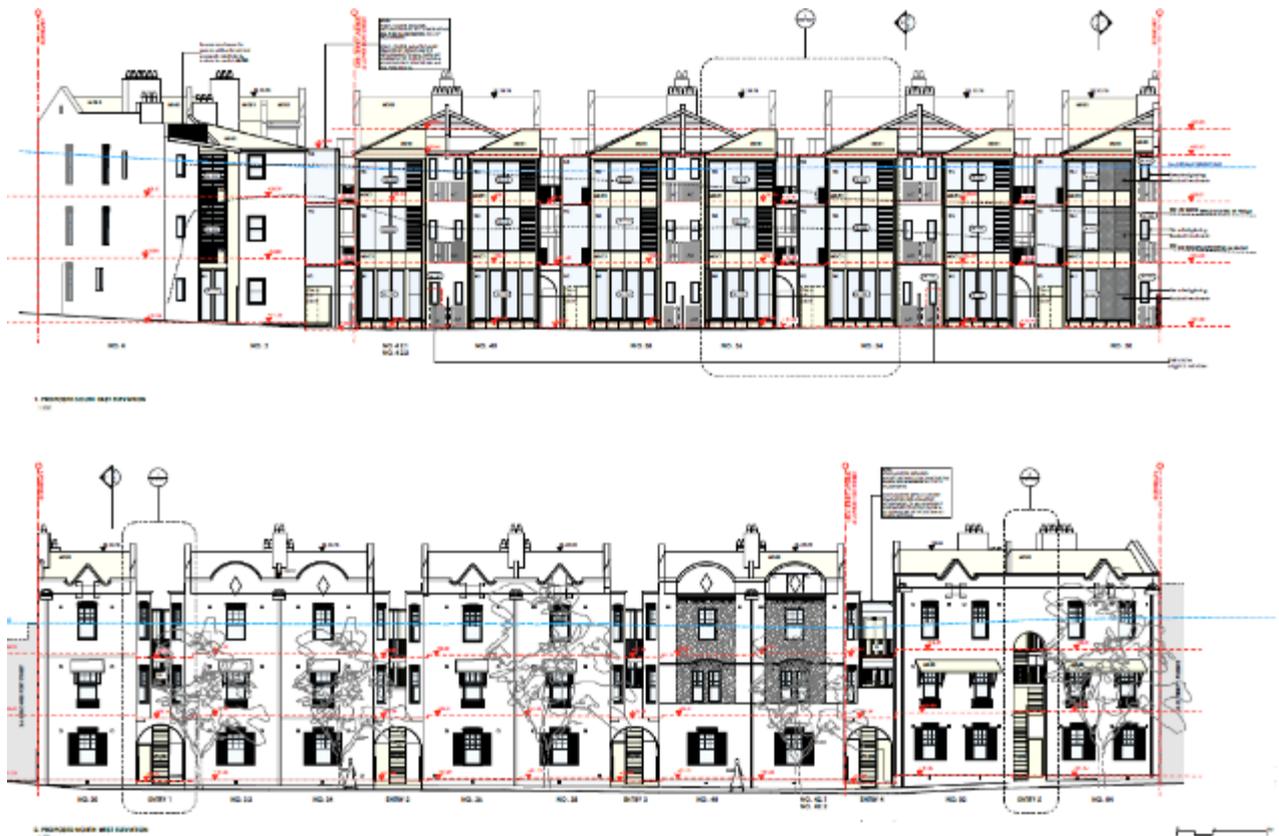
Proposed rear (south-east) and Lower Fort Street (north-west) elevations
